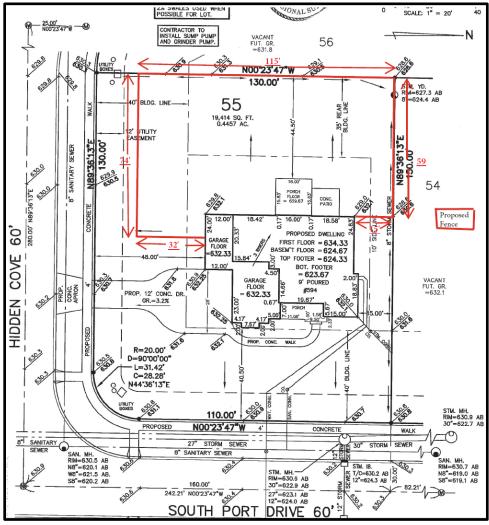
Site Plan – Applicant Provided – CAV 25-8
